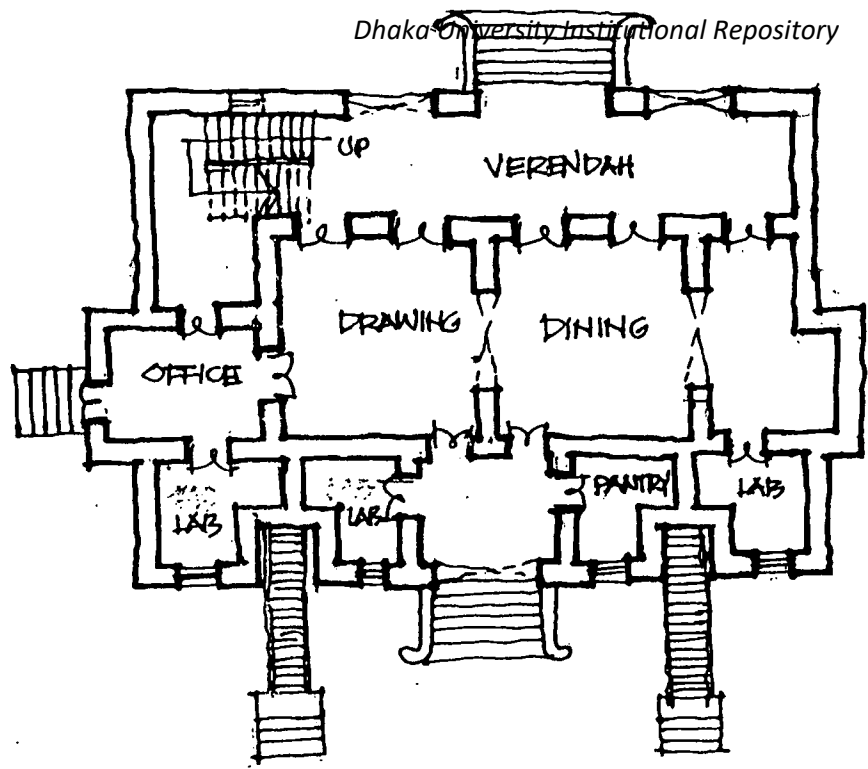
Ground floor plan, Bungalow no-29, Ramna colony, Dhaka
